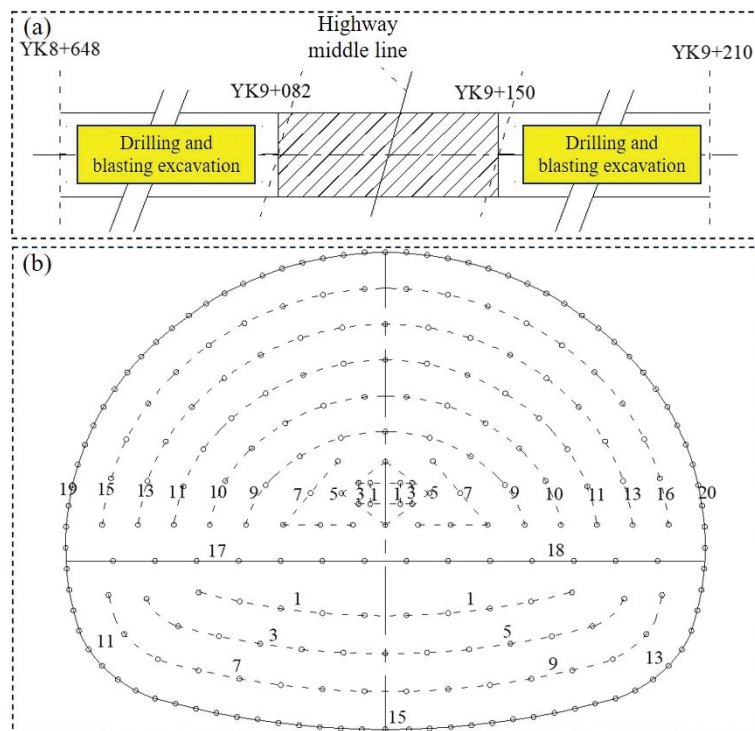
Schematic diagram of tunnel excavation section, borehole distribution and detonator segmentation of drilling and blasting method. (a) Tunnel excavation sections; (b) drilling and blasting hole distribution and detonator segmentation.
